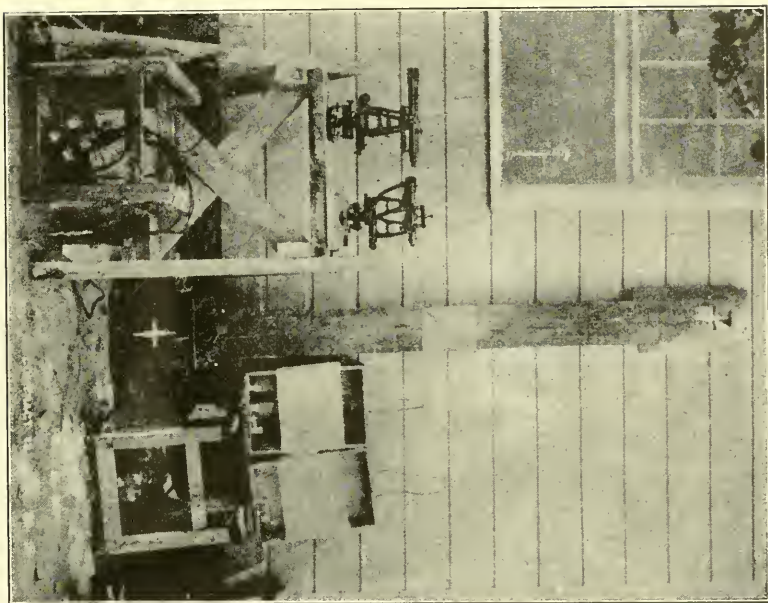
SIGHTING BOARD AND APPARATUS USED FOR LINE DROPPING, KONDOU PRESSURE TUNNEL.
